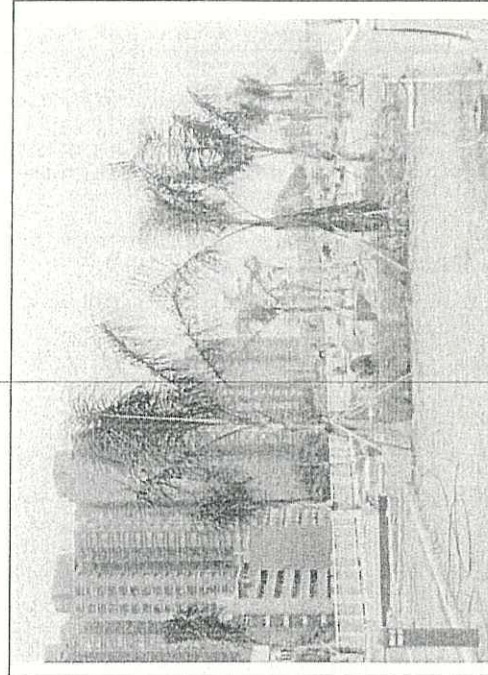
Completion of Landscaping Works at New Road L2 of Long Yat Road (YUL)
